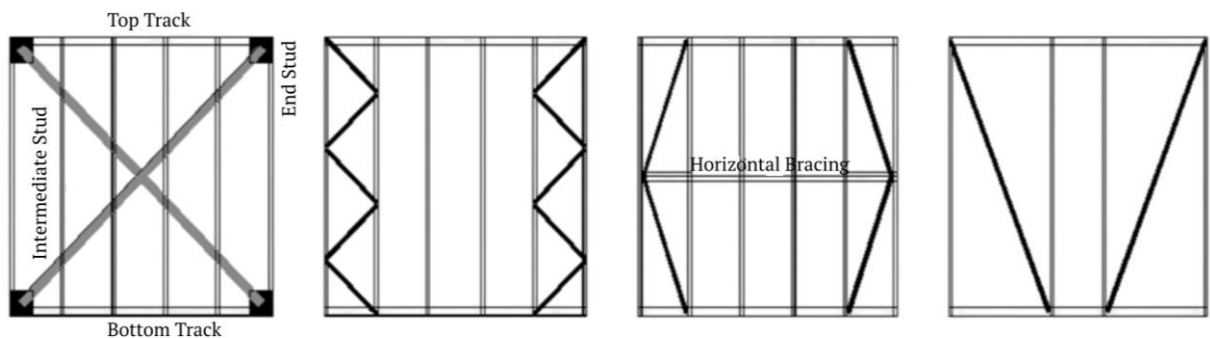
Turkish Building Earthquake Code Light Steel Framing System (Çevre ve Şehircilik Bakanlığı, 2018)
